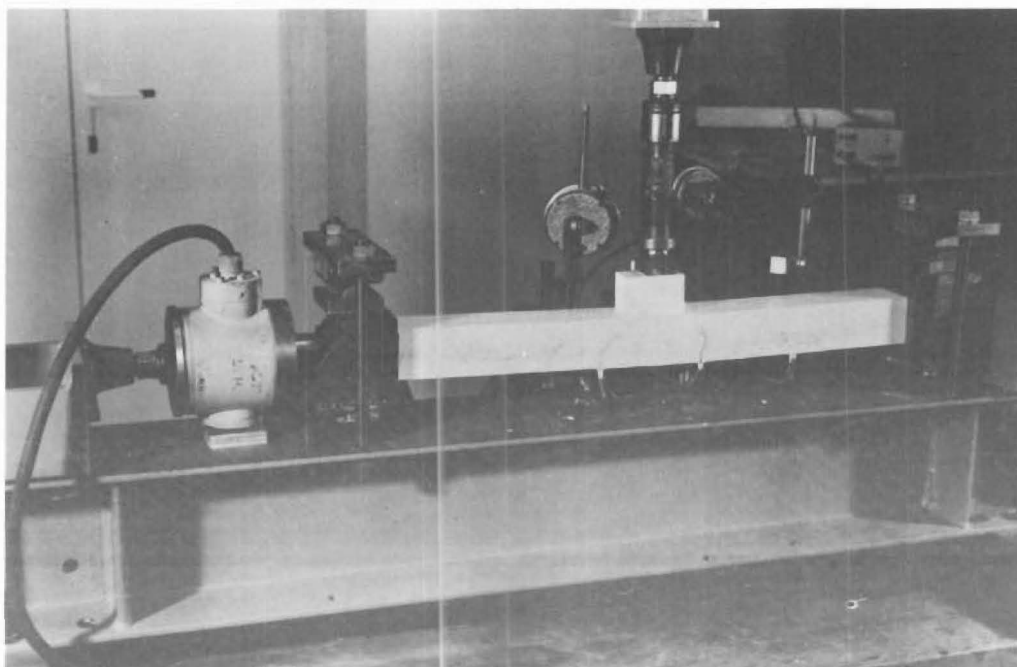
GENERAL VIEW OF STRUCTURAL MEMBER TESTS
